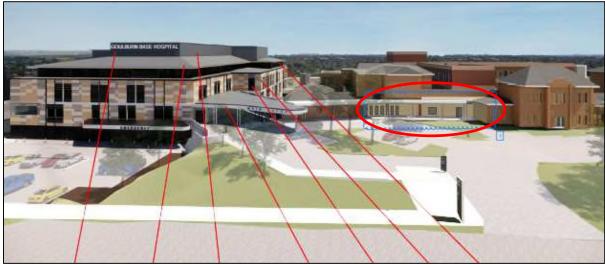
Artist Impression when viewed from Goldsmith Street, red circle highlights area of proposed works under this modification.
